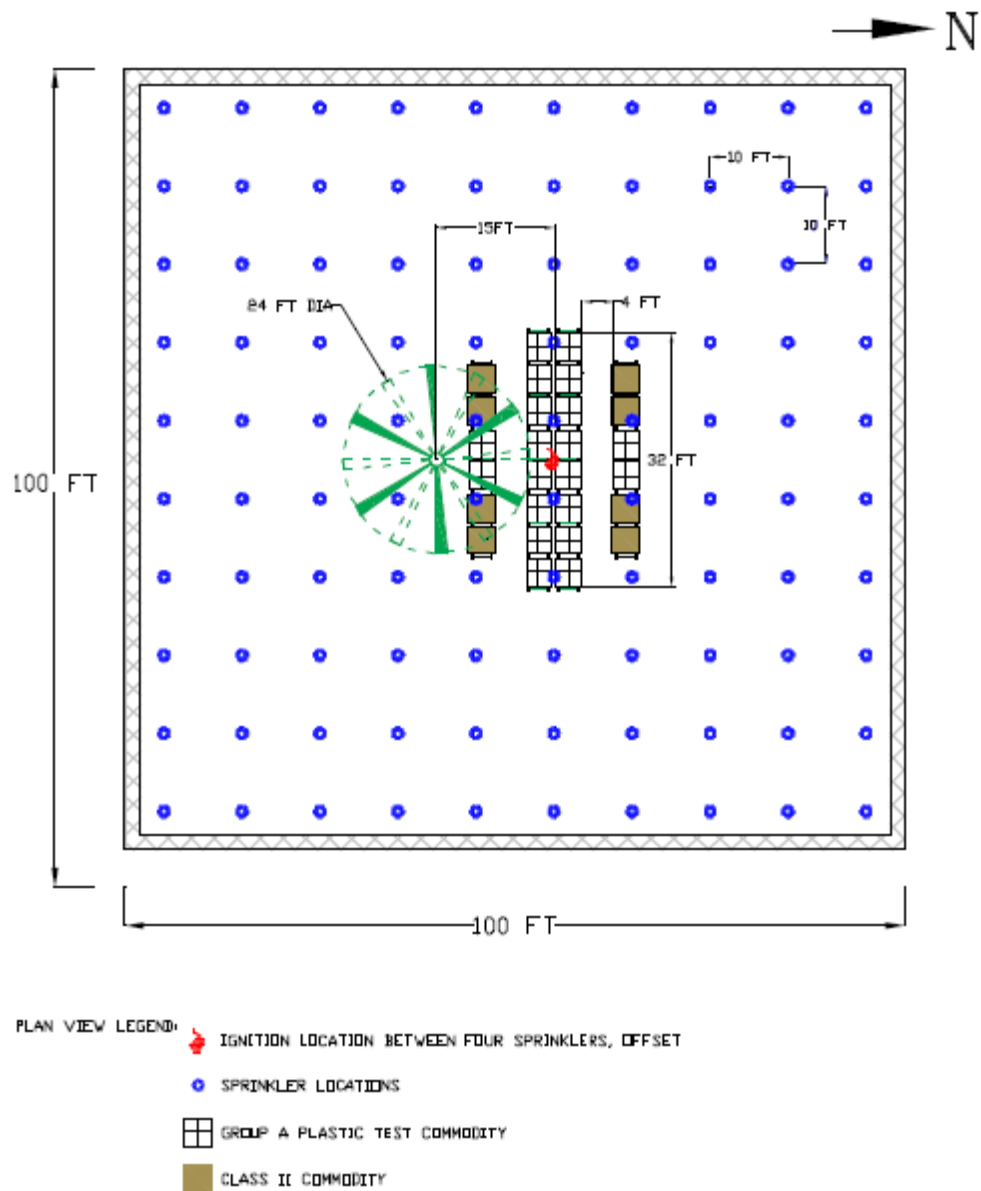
Schematic of the plan view of the storage racks, fuel packages, ceiling fan and ignition location for the high-rack storage section tests, for test arrangement 1 (SEC, 2009)
